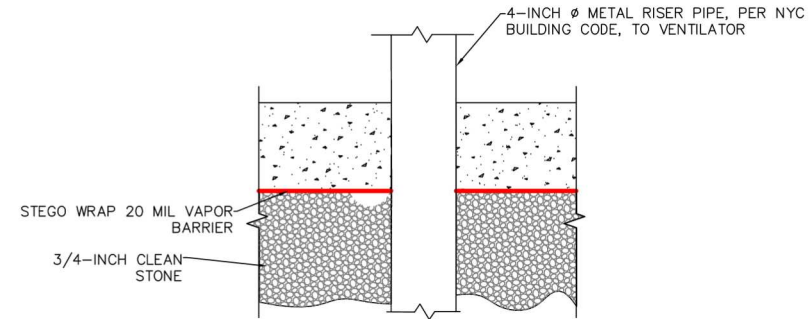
VACUUM MONITORING POINT NOT TO SCALE
